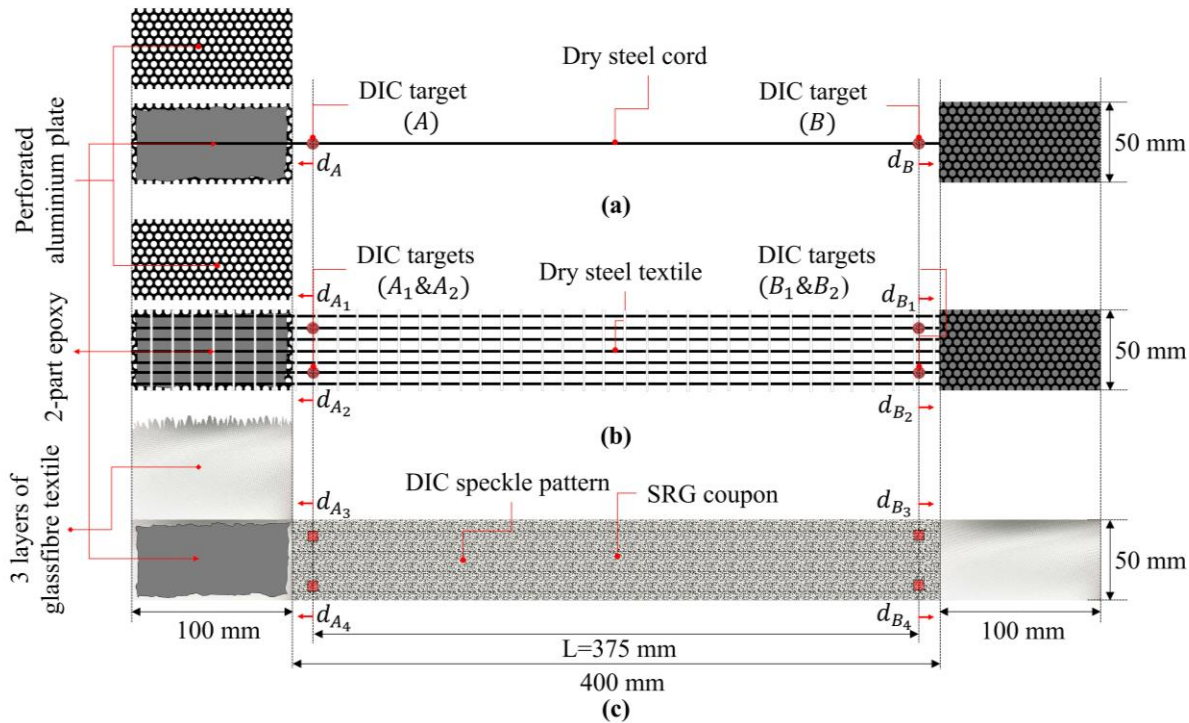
The geometry, instrumentation, and grip details of (a) a typical single steel cord specimen, (b) a typical steel textile specimen, and (c) a typical SRG coupon.
